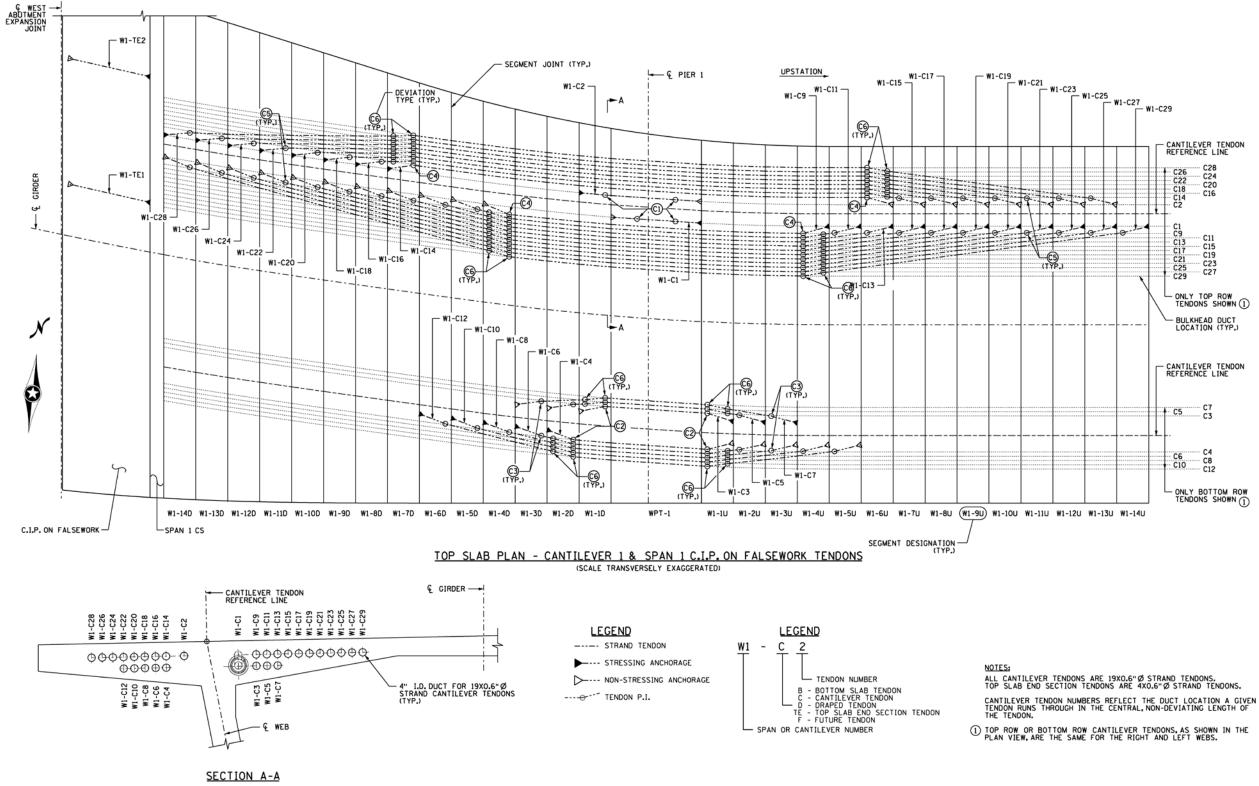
Westbound Cantilever 1 and Span 1 C.I.P. Cantilever Post-Tensioning Layout
